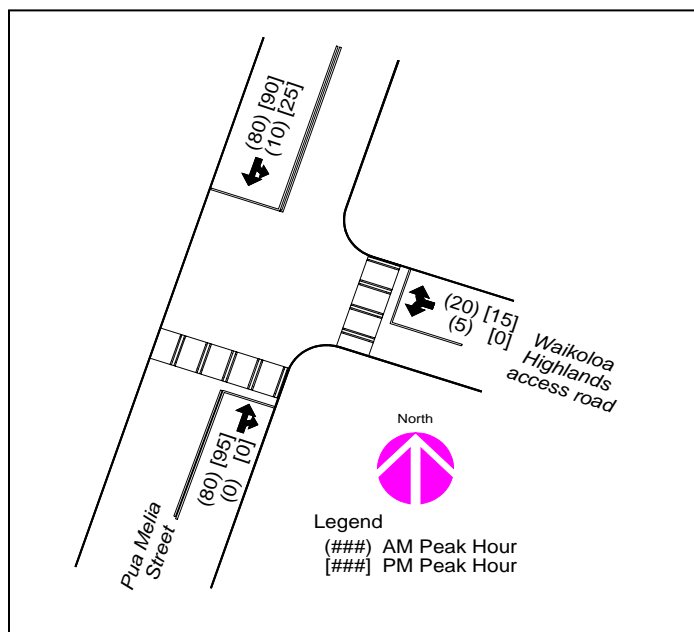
2025 Peak Hour Traffic with Waikoloa Highlands Intersection of Pua Melia Street and Access Road Connection
